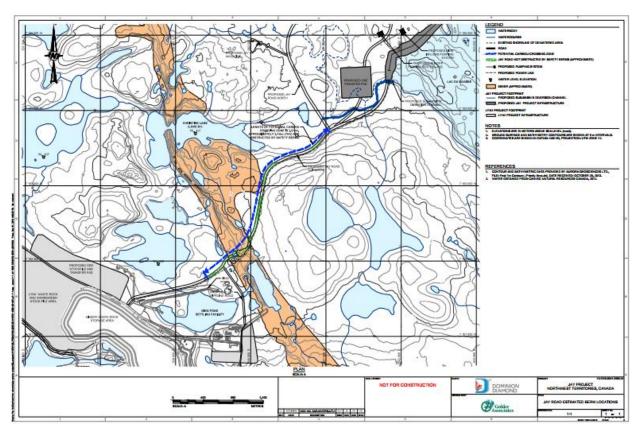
Caribou-crossing zones on the Jay road (Source PR#371, DAR-MVEIRB-UT-01 p4) This map of the Jay road shows the selected alternative (green line) with section to be constructed as a caribou-crossing zone (blue dashed line).
